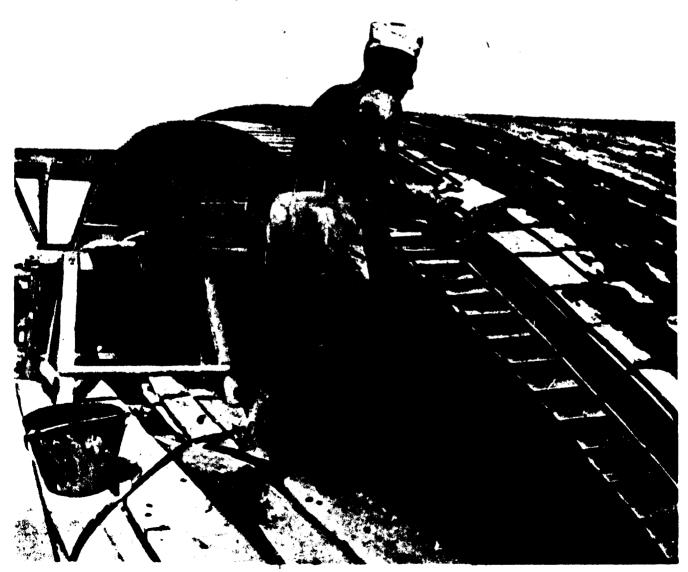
Many special types of blocks for roof construction are developed. The idea of lightweight and semi prefabrication is clearly illustrated.
